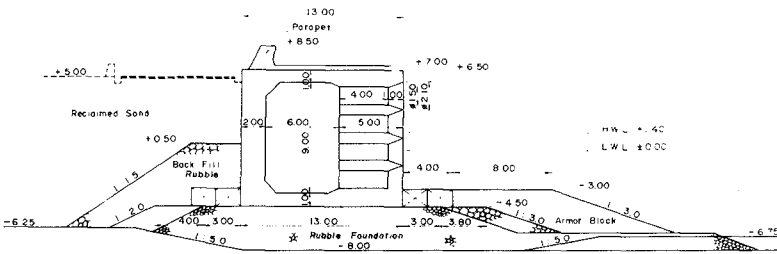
Cross-Section of Seawall by Prefabricated Reservoir Seawall
